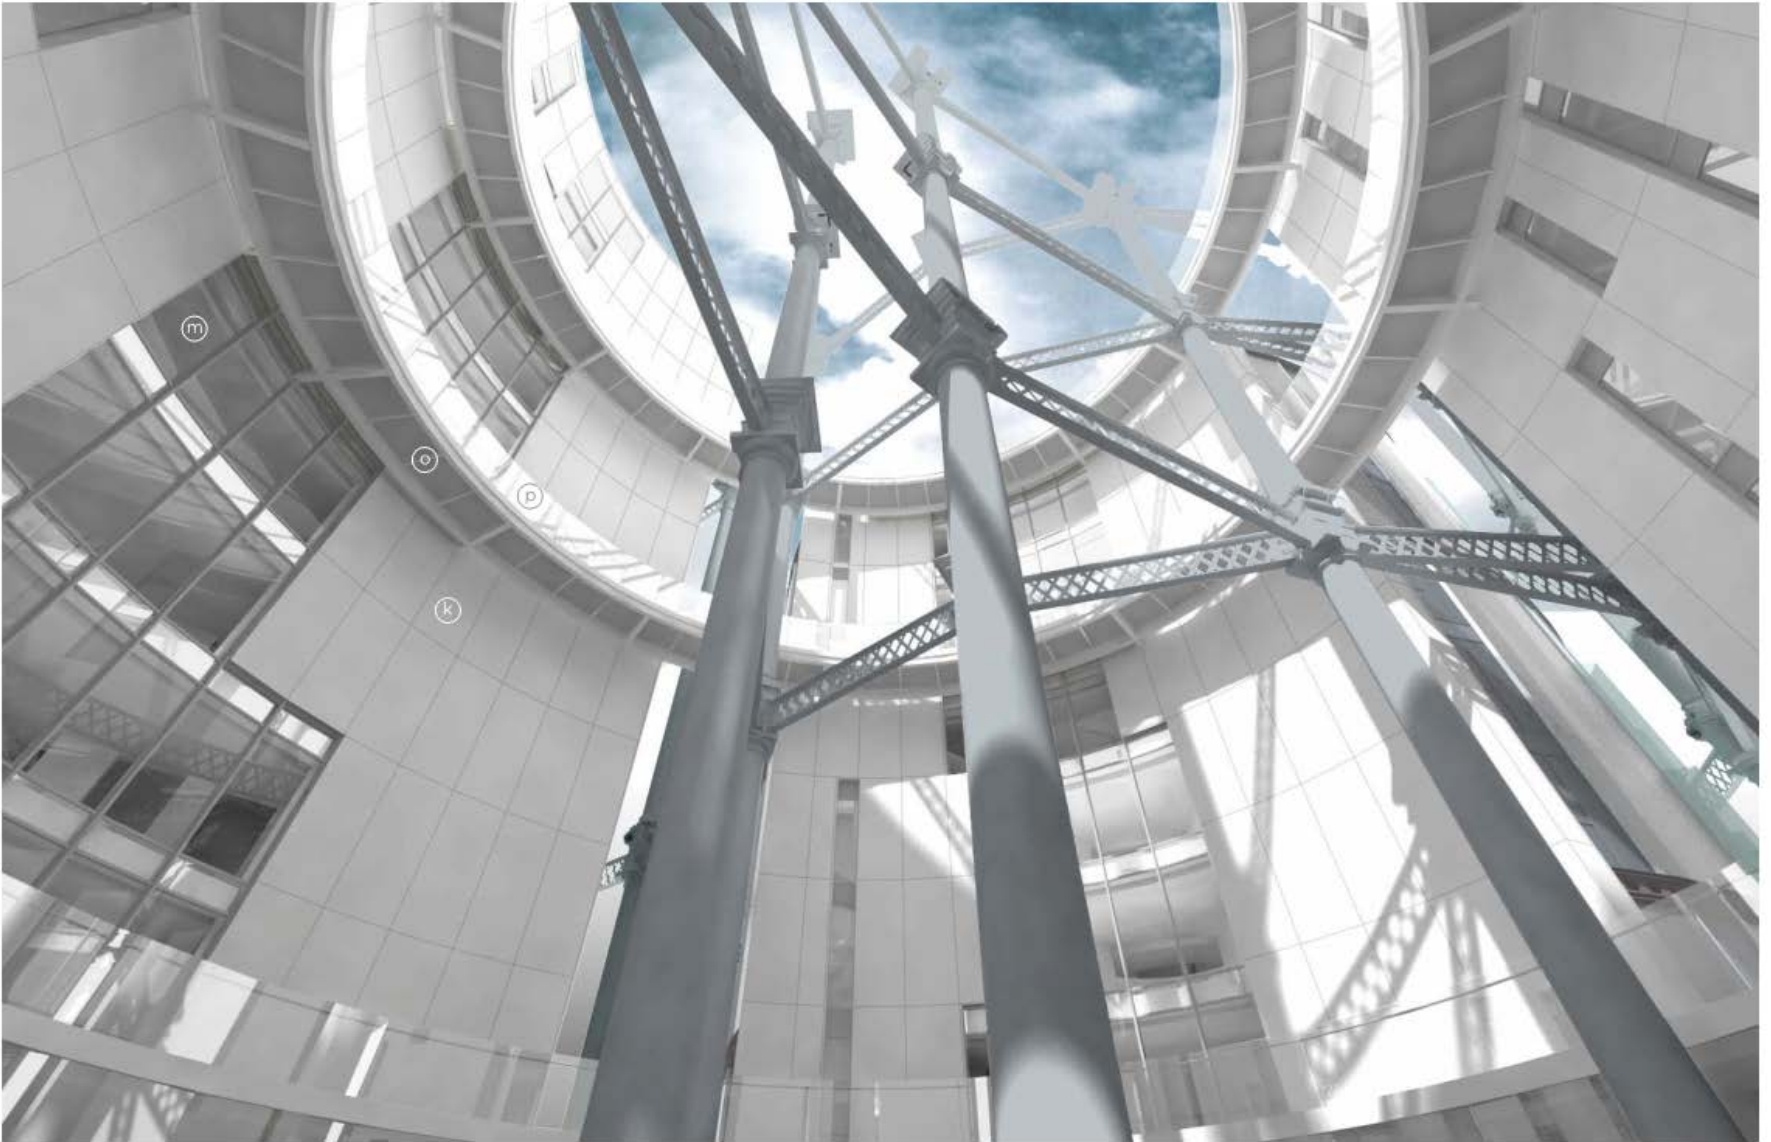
Facade zone 3: Central courtyard with Siamese side frames
